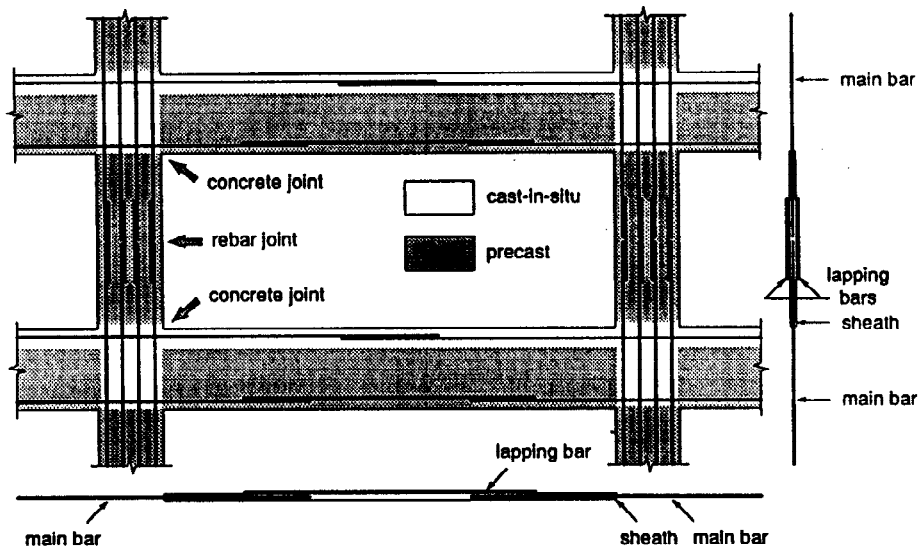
Proposed Frame-Type System for Precast Concrete Structures
